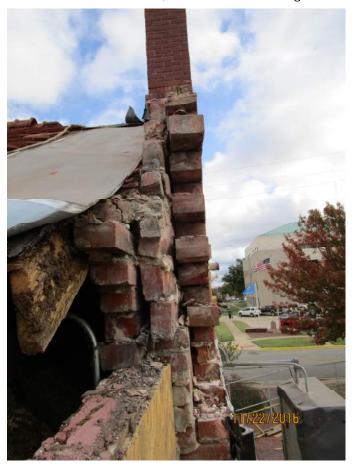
November 22, 2016: Damaged Rafter at South Gable Exposed
